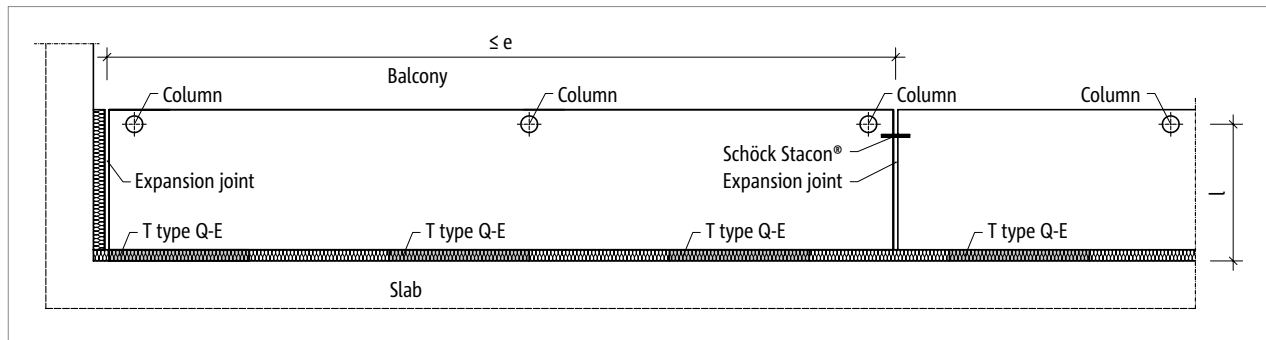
Schöck Isokorb® T type Q-E: Expansion joint spacing
